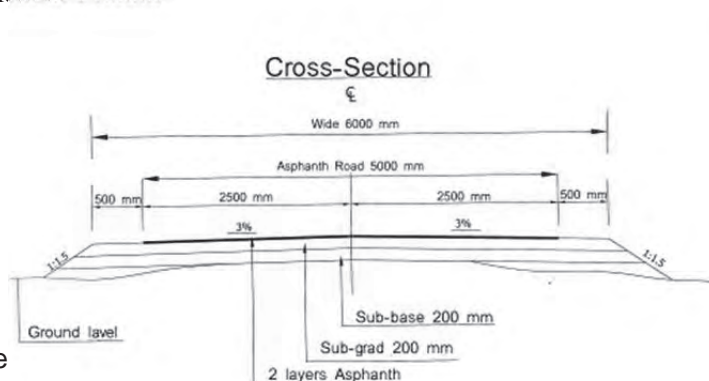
Improvement plan of infrastructure at KM32 existing final disposal site
